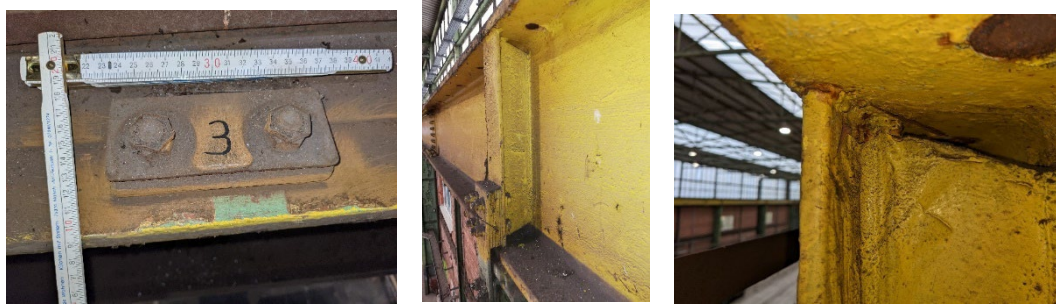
(a) Crane runway top flange welded-on rail double-clamp (photo IPU/pk 2022);
